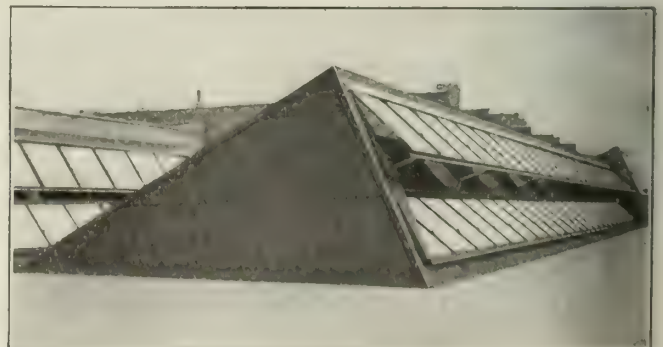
DETAILS OF BLASKI VENTILATING SKYLIGHT- DOUBLE PITCHED
